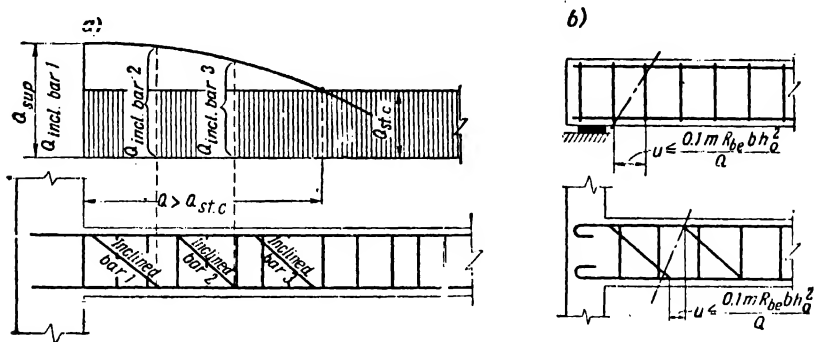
Position of bent-up bars in beams, and maximum spacing between stirrups and bent-up bars
